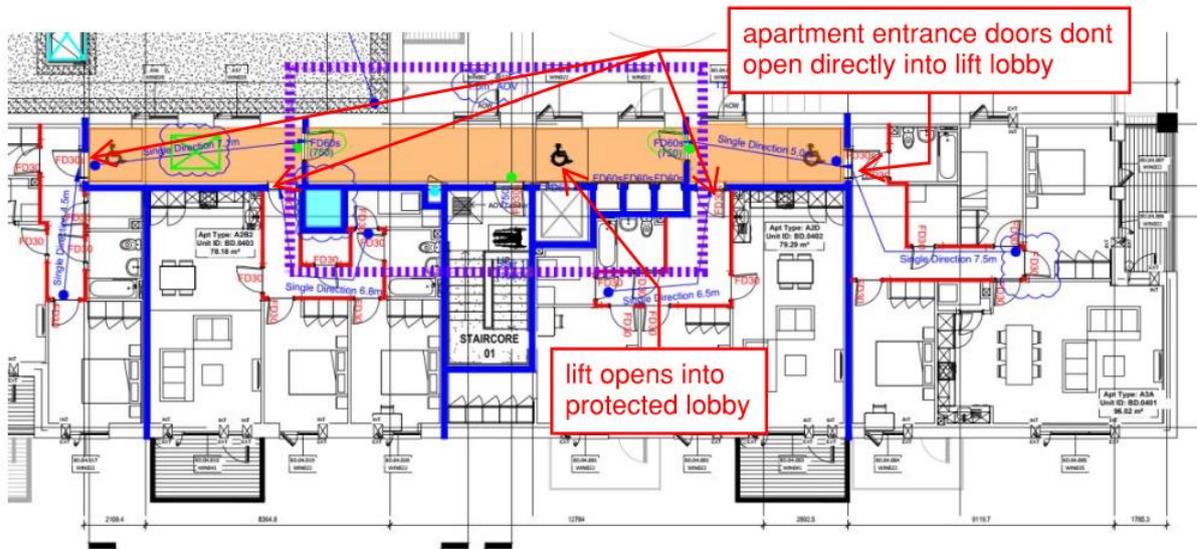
Block D, fourth floor plan – lift accessed via lift lobby with no apartments opening into same
